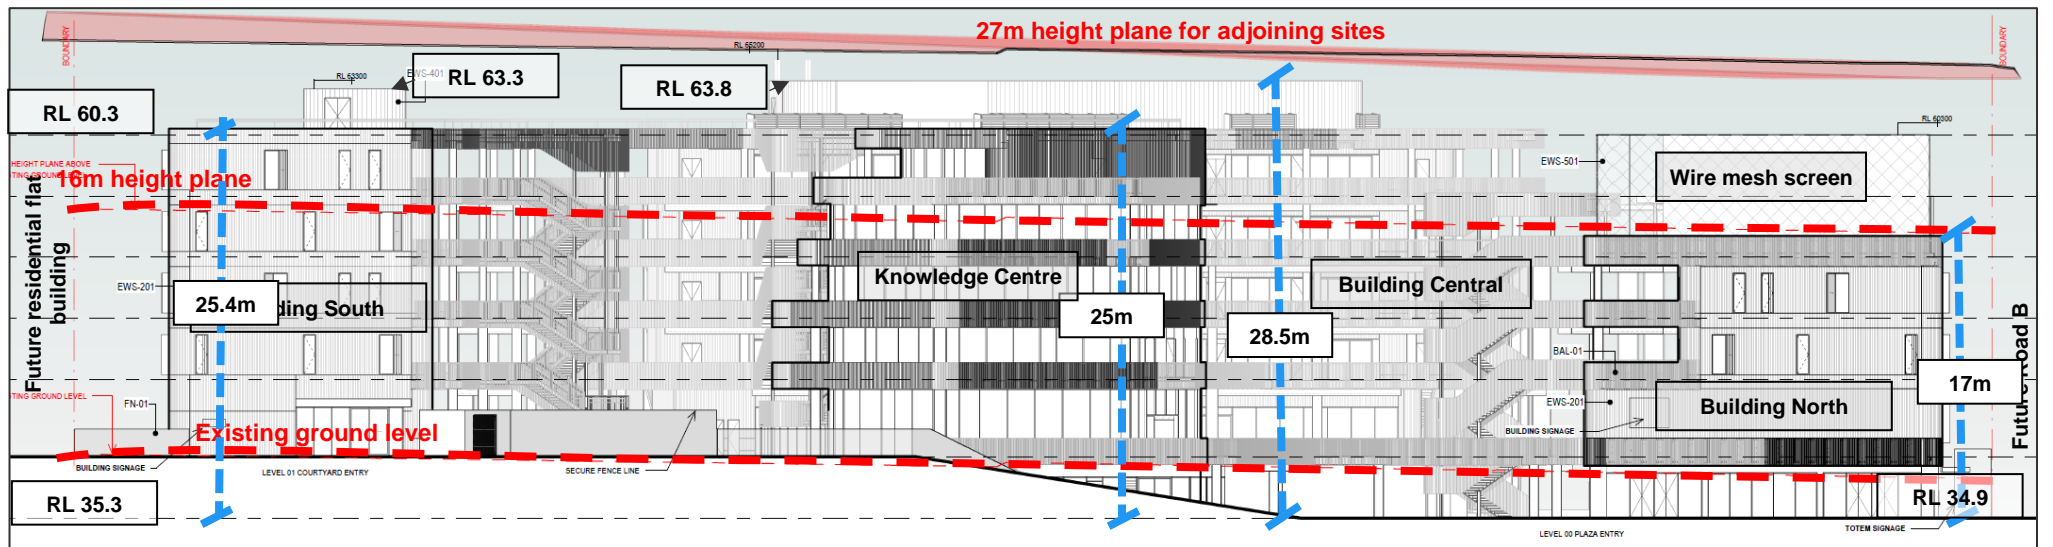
| Eastern elevation as viewed from the town centre plaza (Source: Applicant's SRtS)
